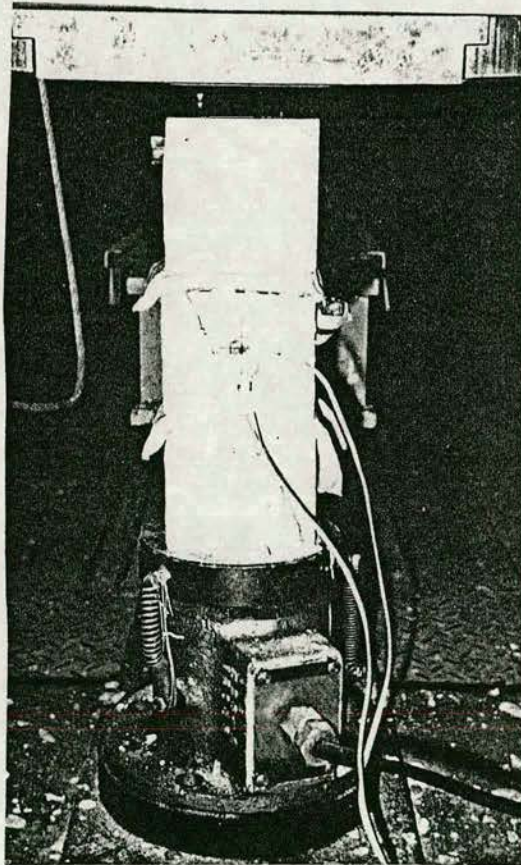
Three steel moulded concrete cubes separated and capped with 1 - 2 mm dental plaster joints.
